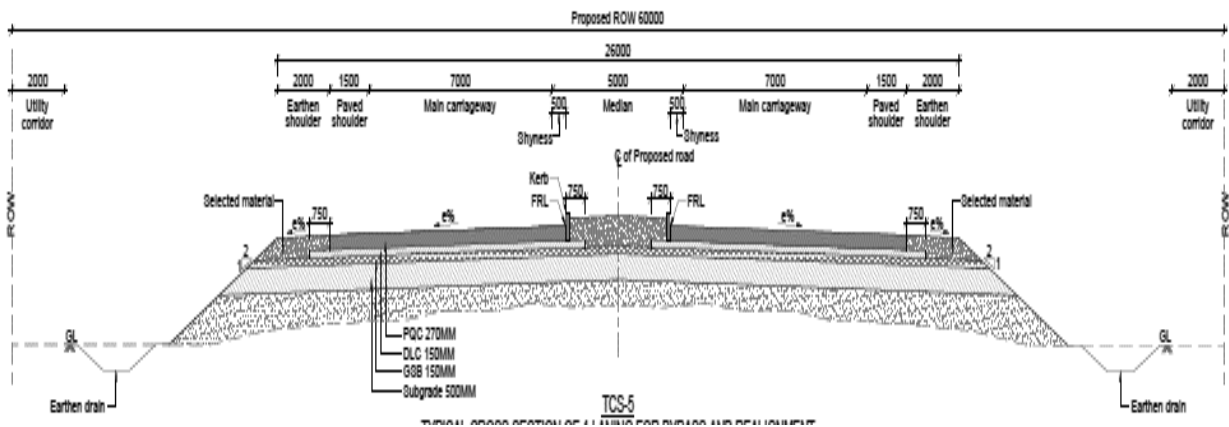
(TCS-5) Typical Cross Section of 4-Laning for Bypass and Realignment
